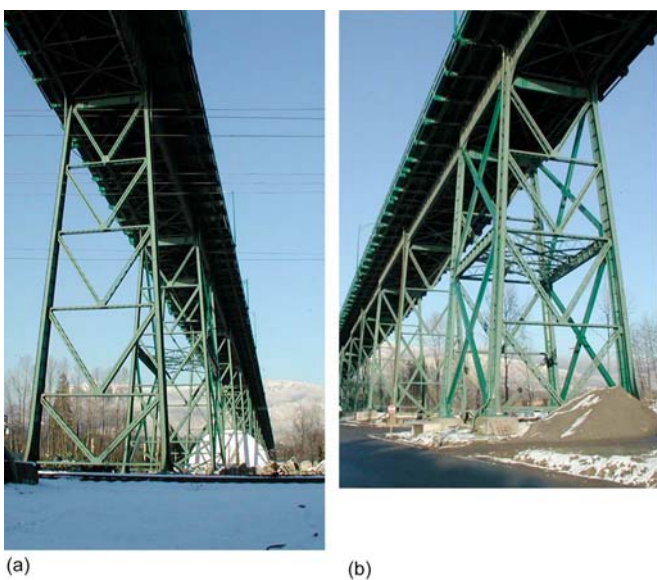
Typical prototype steel truss bridge piers (Courtesy of Bruce Hamersley, Klohn Crippen Berger Engineering): (a) two-legged piers; (b) four-legged pier
